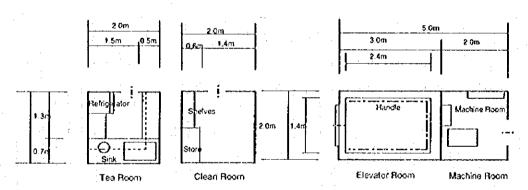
Tea/Clean Rooms and Elevator Machine Room
